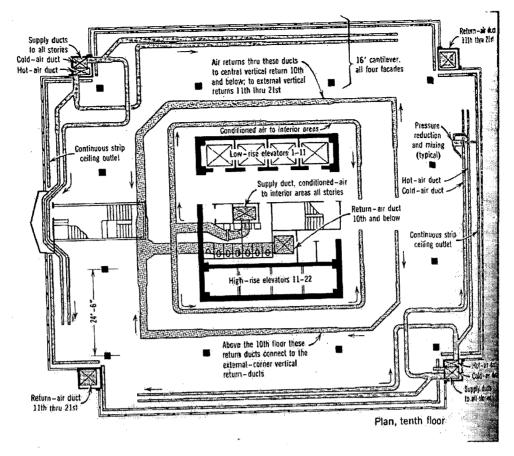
Floor plan, International Building San Francisco Source: McGuinnes W.J., Mechanical and Electrical Equipment for Building
